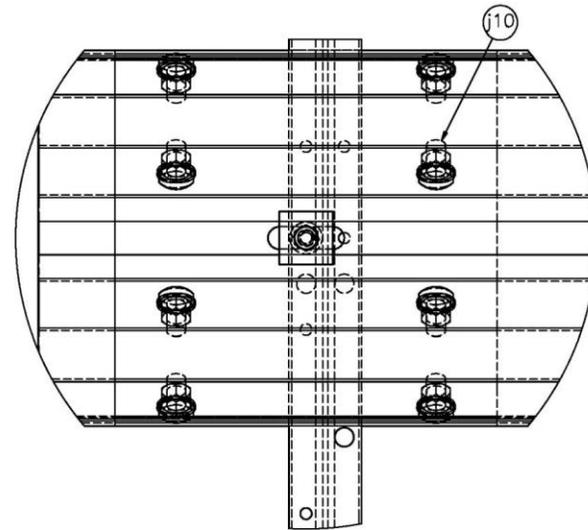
Downstream Anchorage Details, Test No. NYBWT-2
